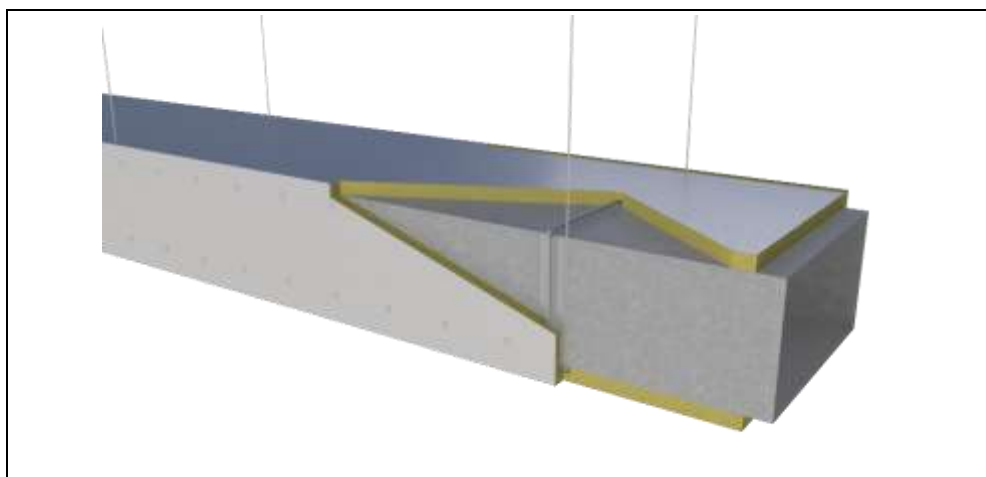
General view of the fire protected horizontal ventilation duct.
